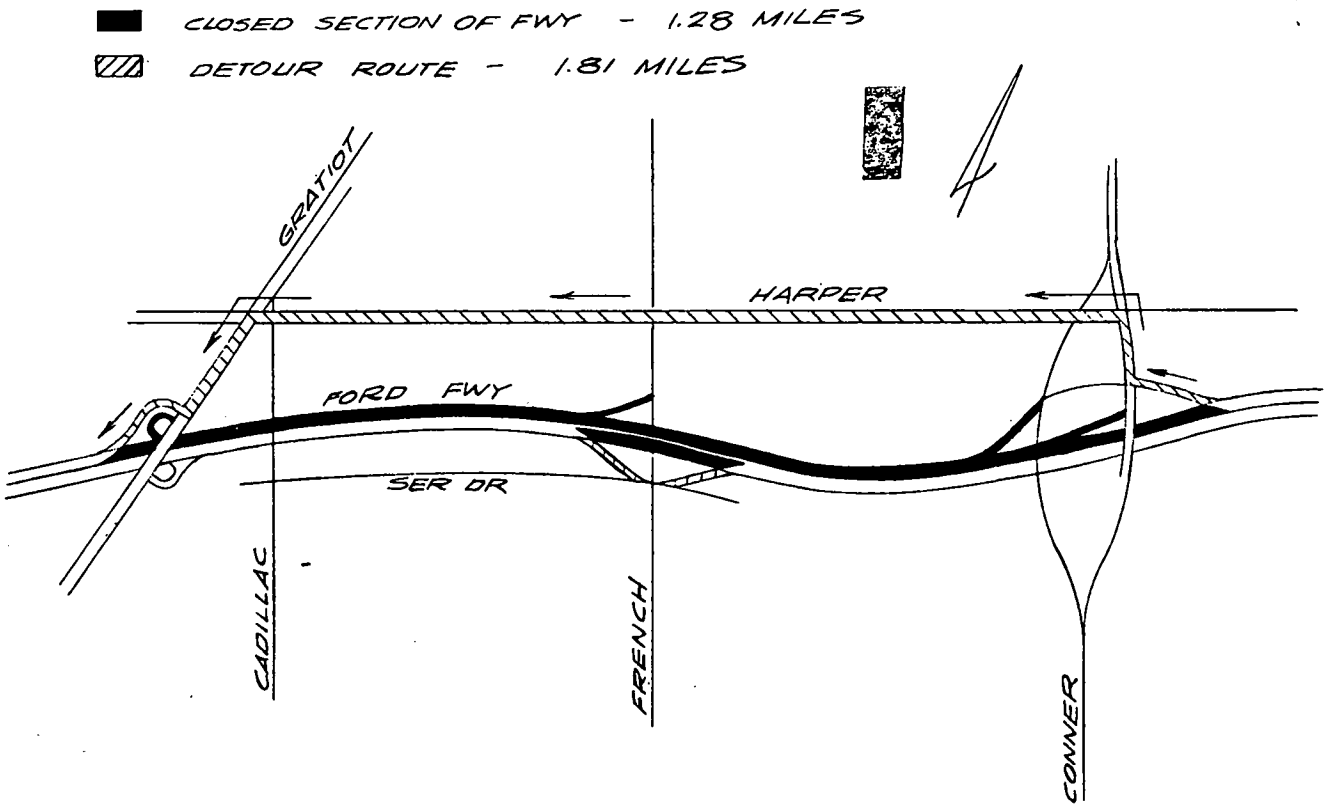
Alternate route plan for closure of a section of the Edsel Ford Freeway developed by the Department of Streets and Traffic, City of Detroit.
